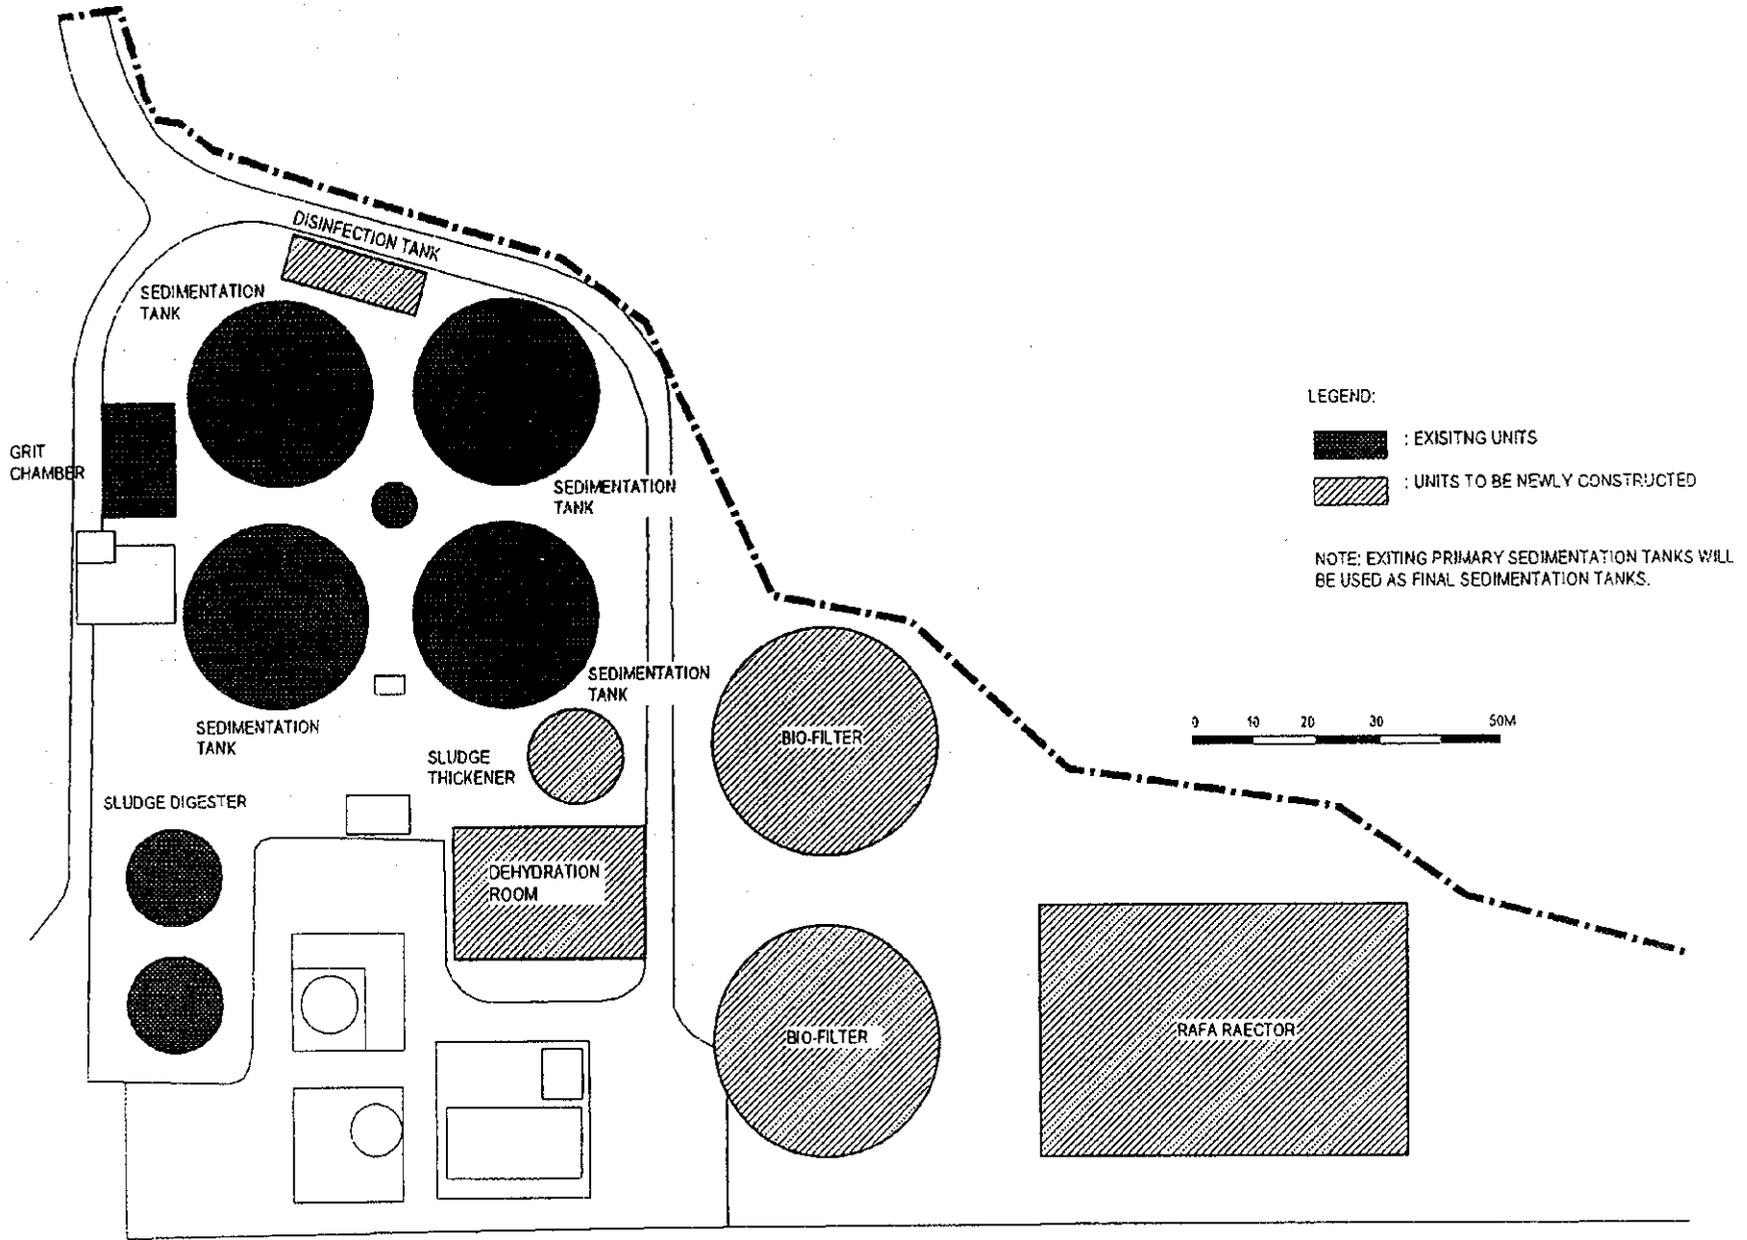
Layout Plan of Cabanga Treatment Station
